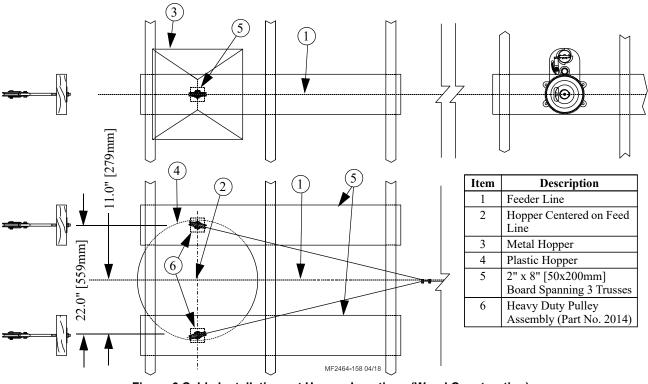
Cable Installations at Hopper Locations (Wood Construction)
